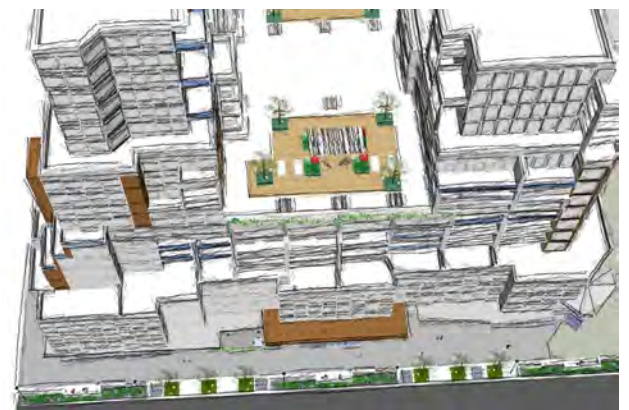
Building setback ratio of 1:5 from streetwall, seen from above
